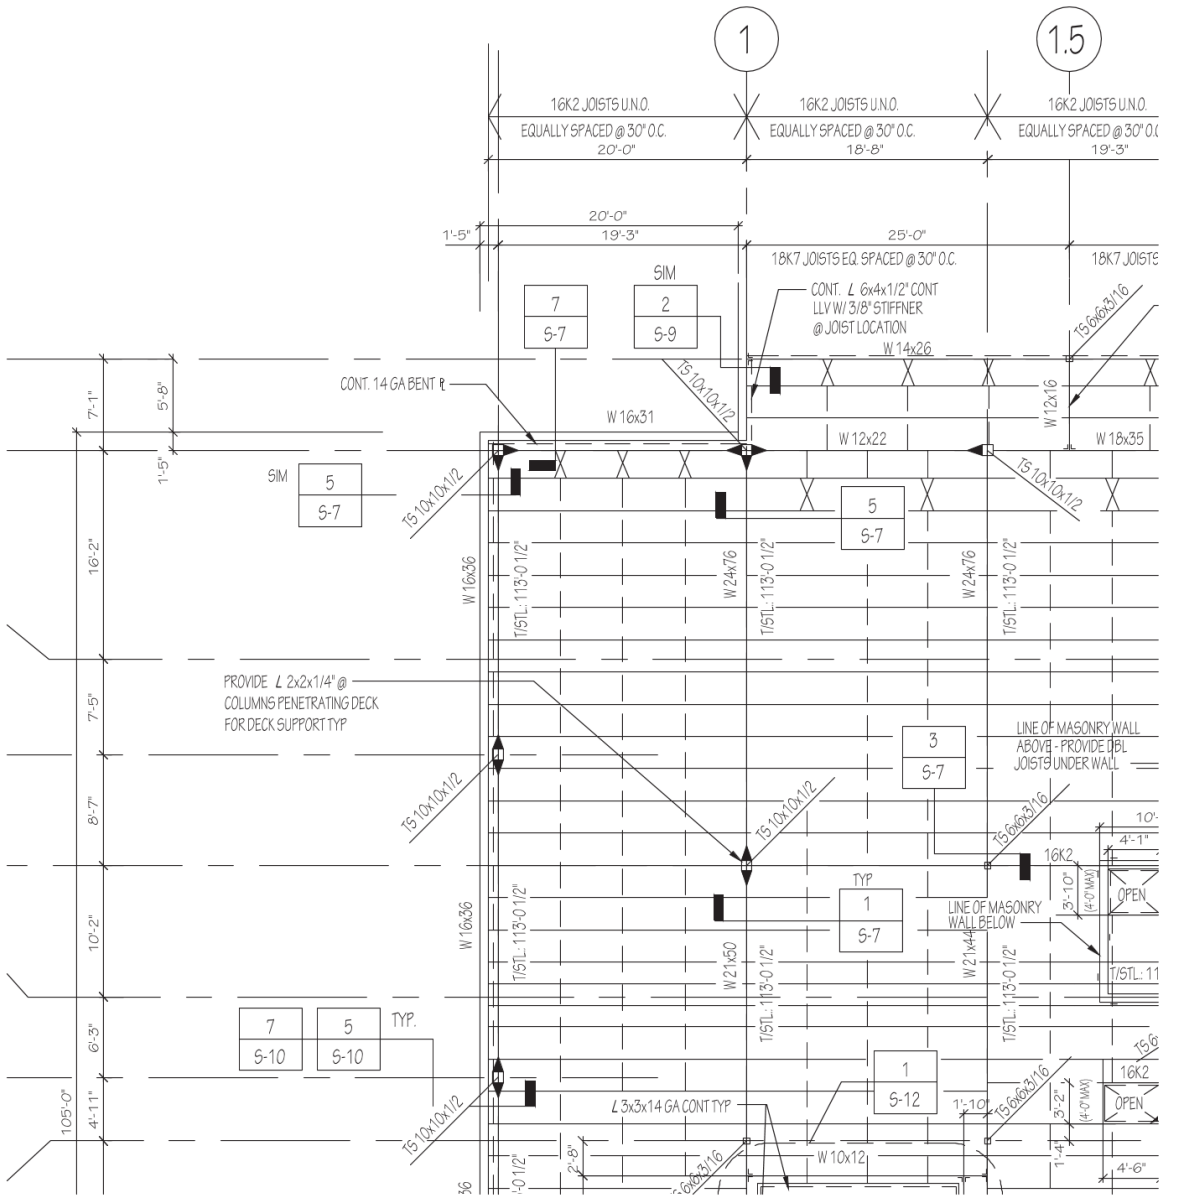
A partial structural steel floor framing plan for a commercial building. This type of drawing would be part of the S series of prints (Structural prints).
